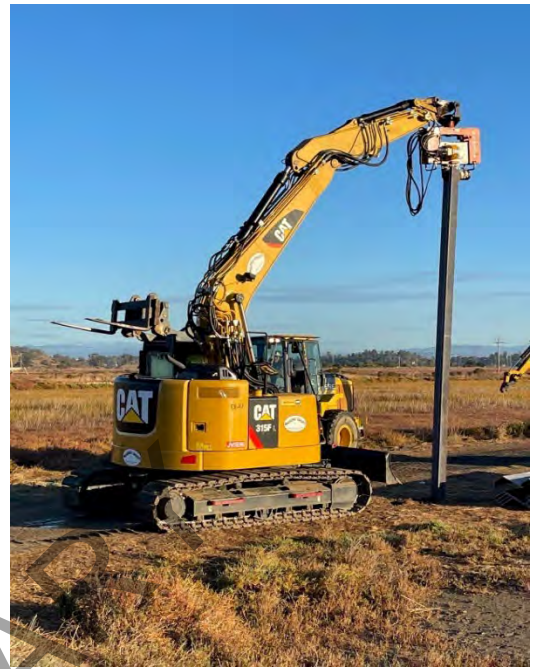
Maximum excavator reach allows for loading of a 20 feet long sheet, but installation is likely only feasible with an 18 feet long sheet.
